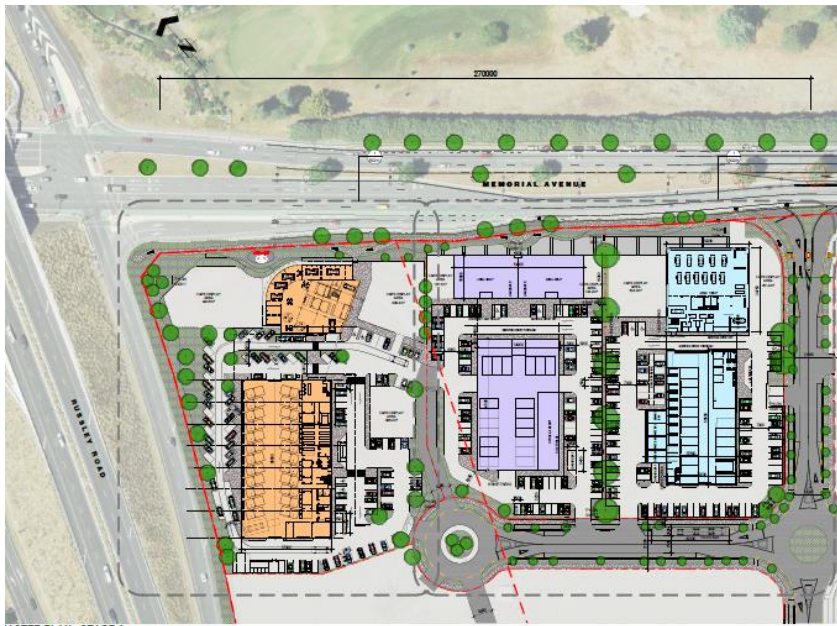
2021 land use consent application – site plan and proposed development perspectives
